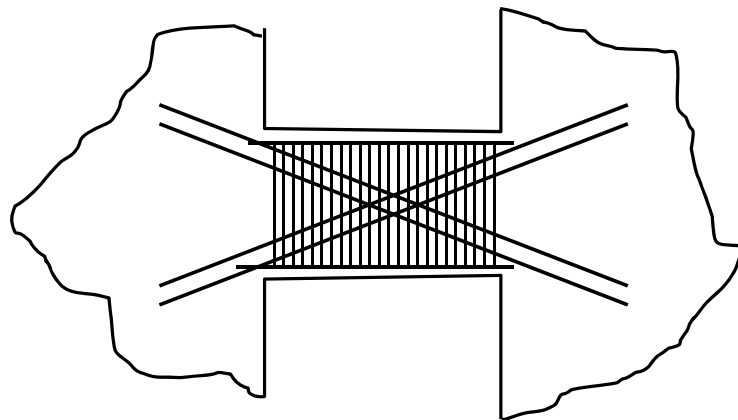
Alternative detailing for reinforcement of shear-controlled coupling beams permitted by ACI 318-11.
